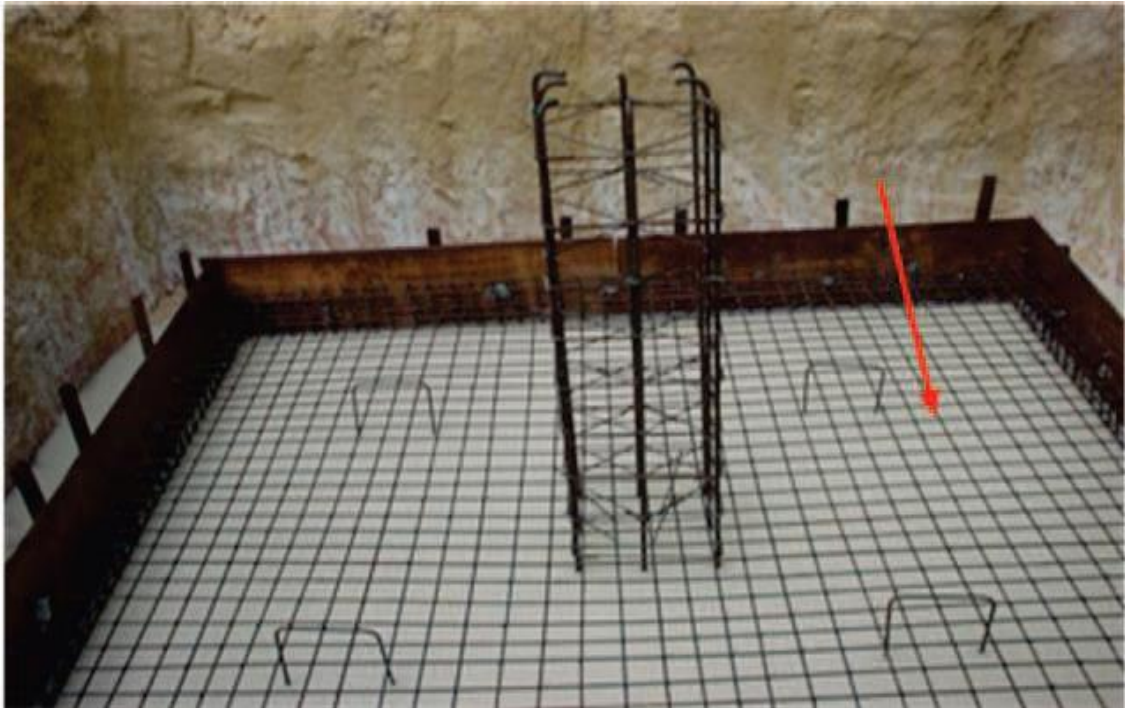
Reinforced concrete foundation of the tower effectively providing low earth resistance
